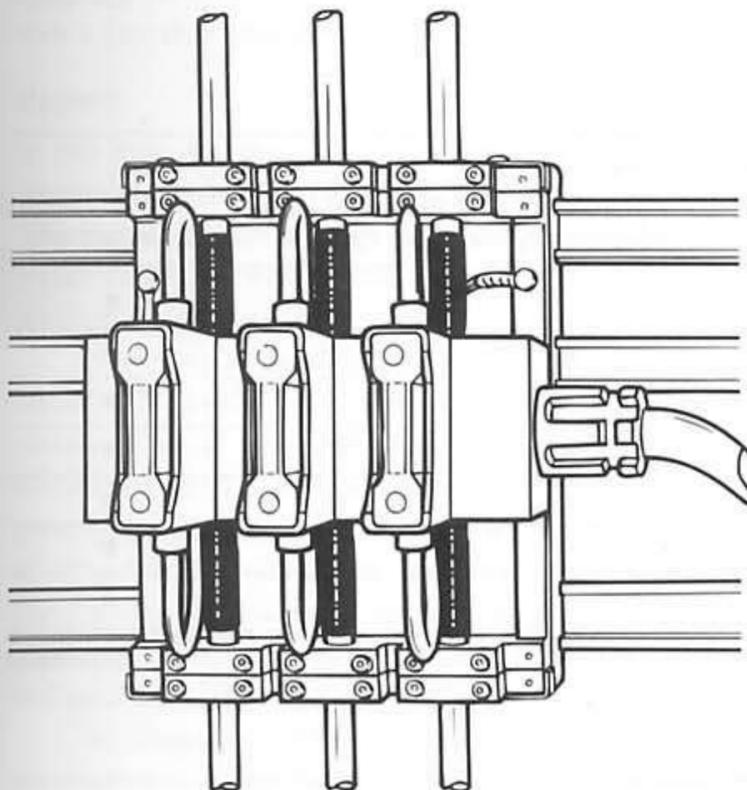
Fuses installed to protect cables teeing-off vertical mains in a multistoreyed building MM CABLES PYROTENAX
